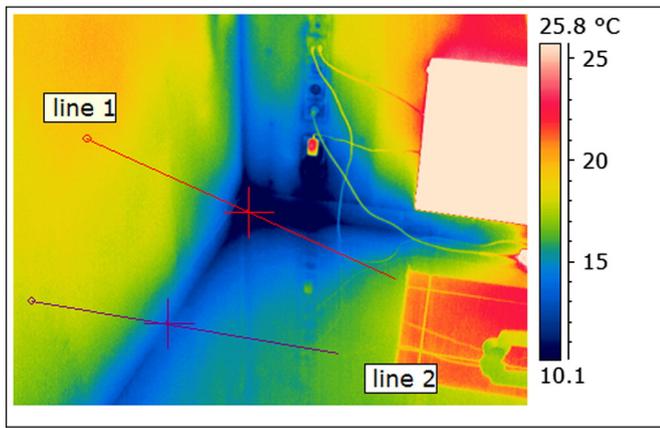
Thermographic photo of junction of the wall and floor leakage places.
